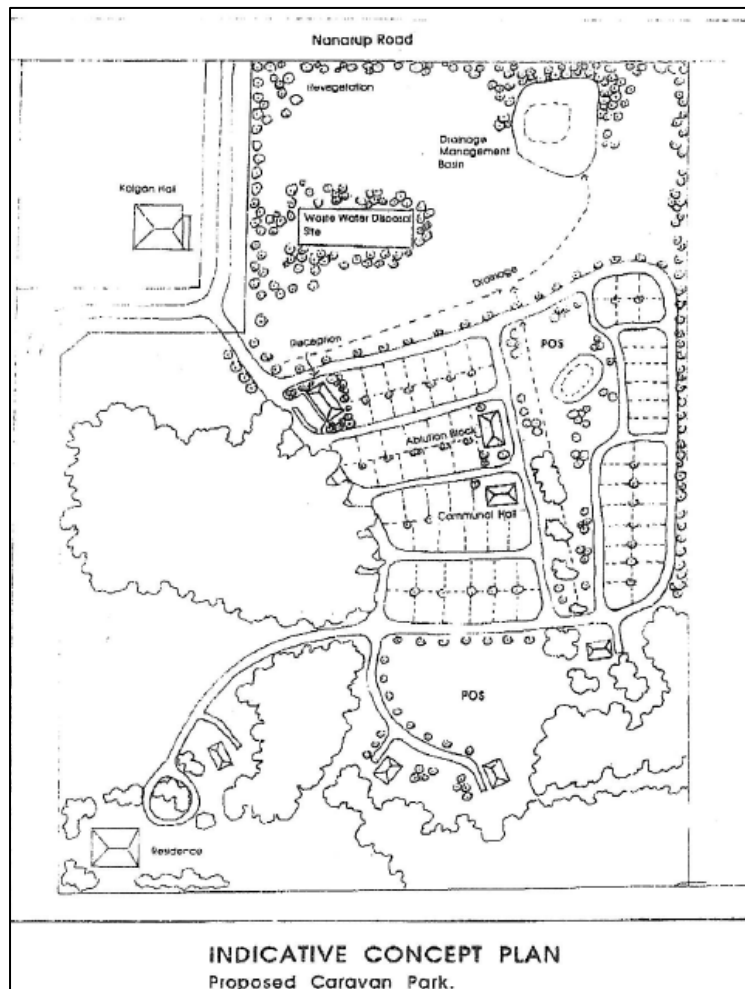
Indicative Concept Plan for 75 bay caravan park.
